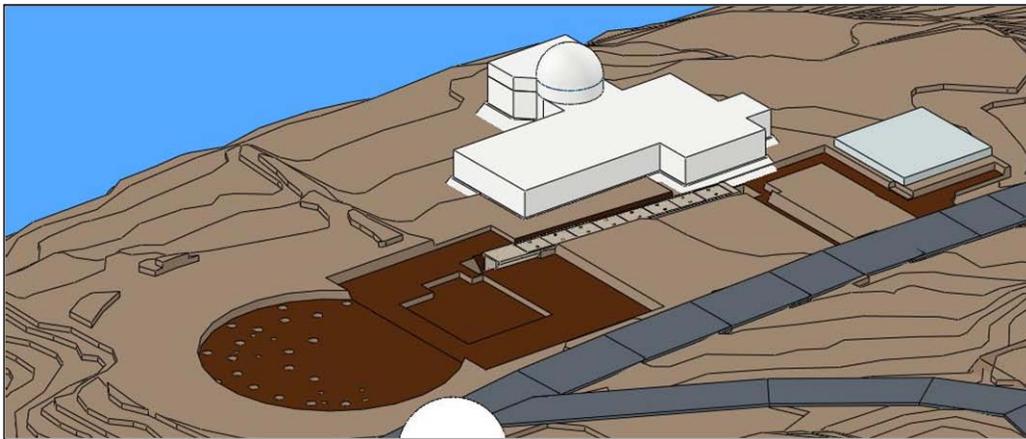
Excavation and caisson drilling will be completed in preparation for building fabrication.
